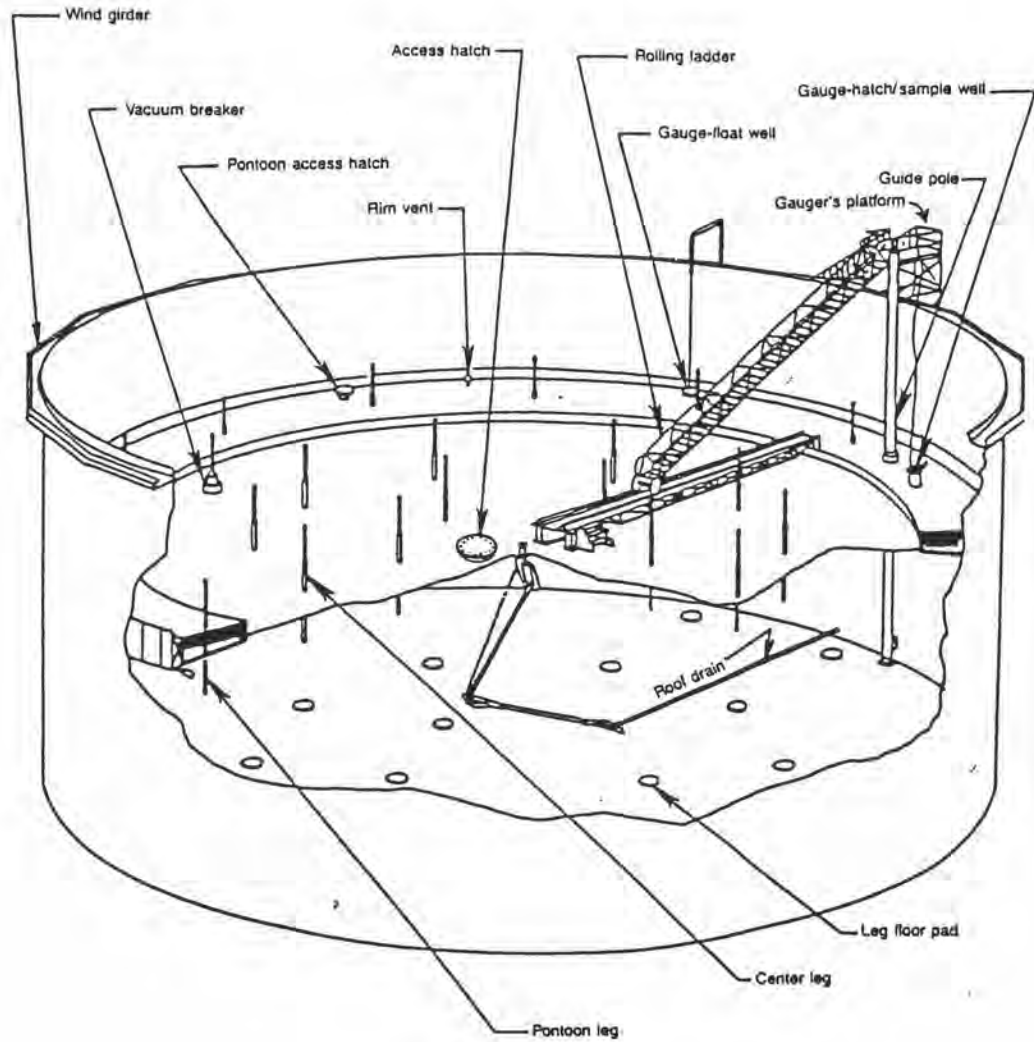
External Floating-Roof Tank with Pontoon Floating Roof [3]
